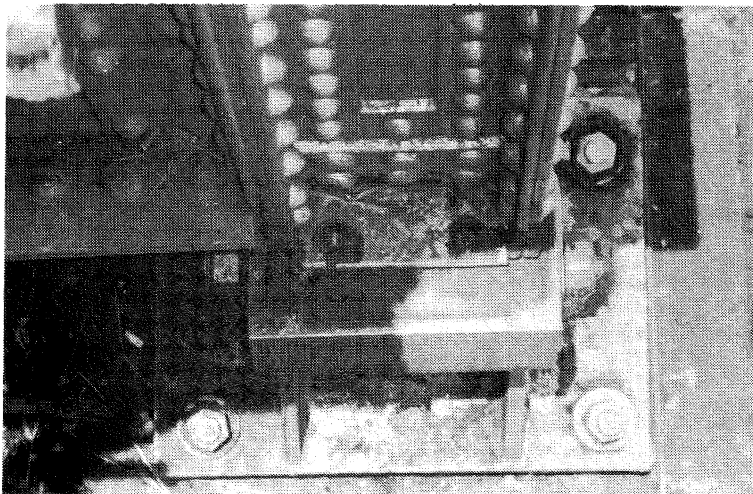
Shear failure of bolts at a girder support of the bridge shown in Figure 5.2.3
